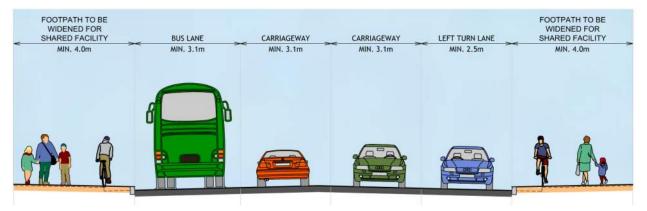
Typical Section 1 Option C Cross Section Ballinacurra Rd - Shared Facility at Left Turn Lane into Crescent
